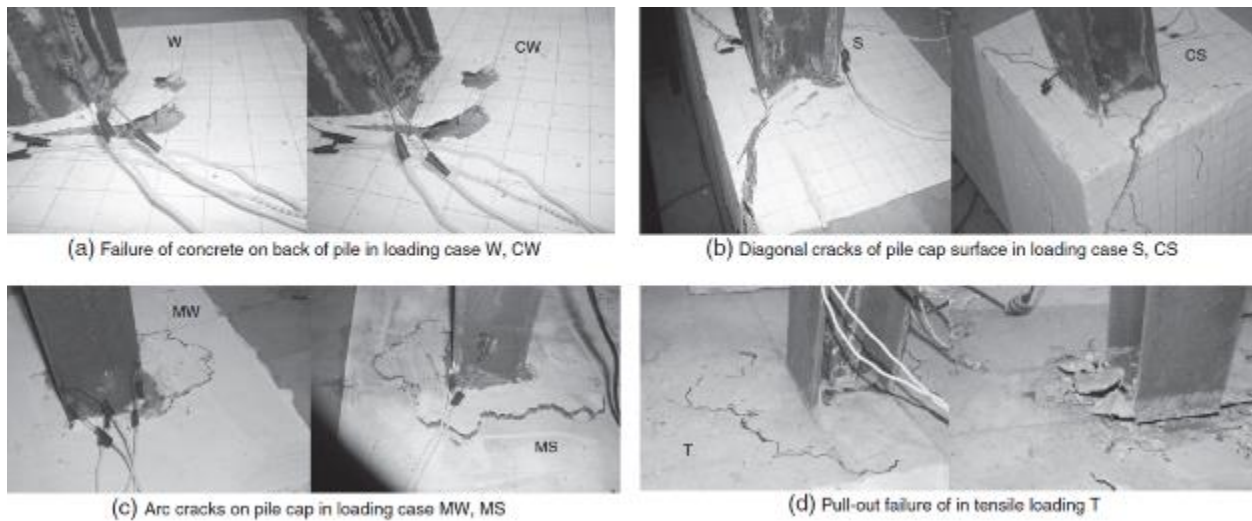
Observed failure in test specimens, (Xiao & Chen, 2013)
